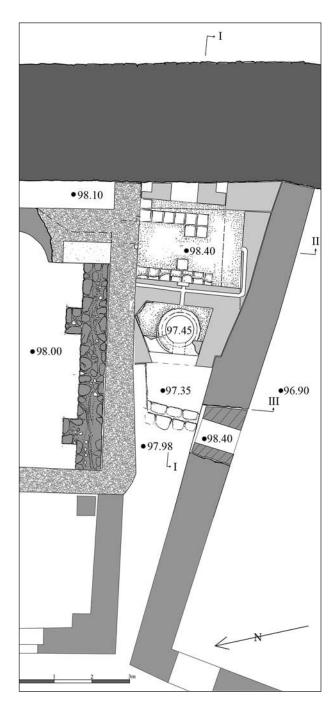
Bath in the Castle, plan of unearthed structural remains (scale 1:100)
